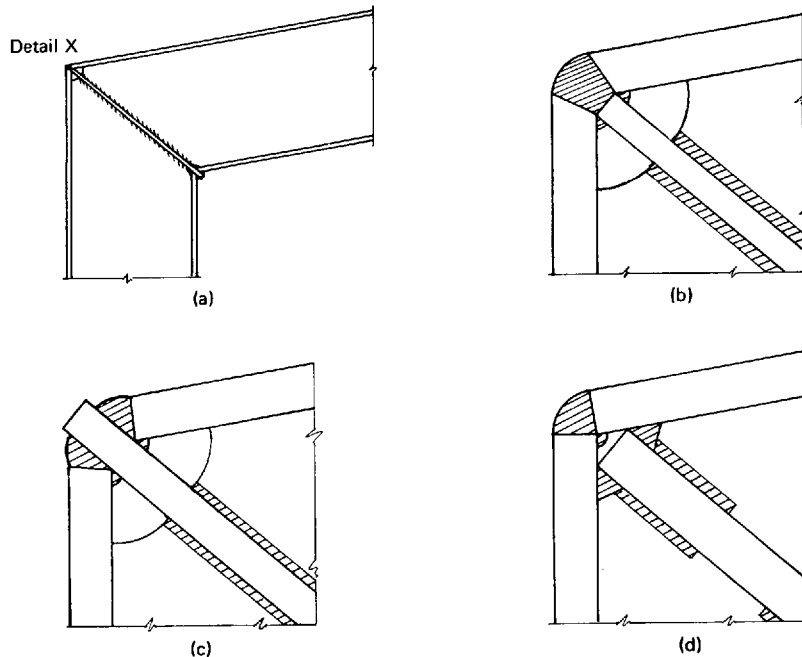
Welded eaves connections. (a) General arrangement; (b) detail X with curtailed division plate; (c) detail X with long division plate; (d) detail X with butt welds connecting main sections and subsequently fitted stiffener
